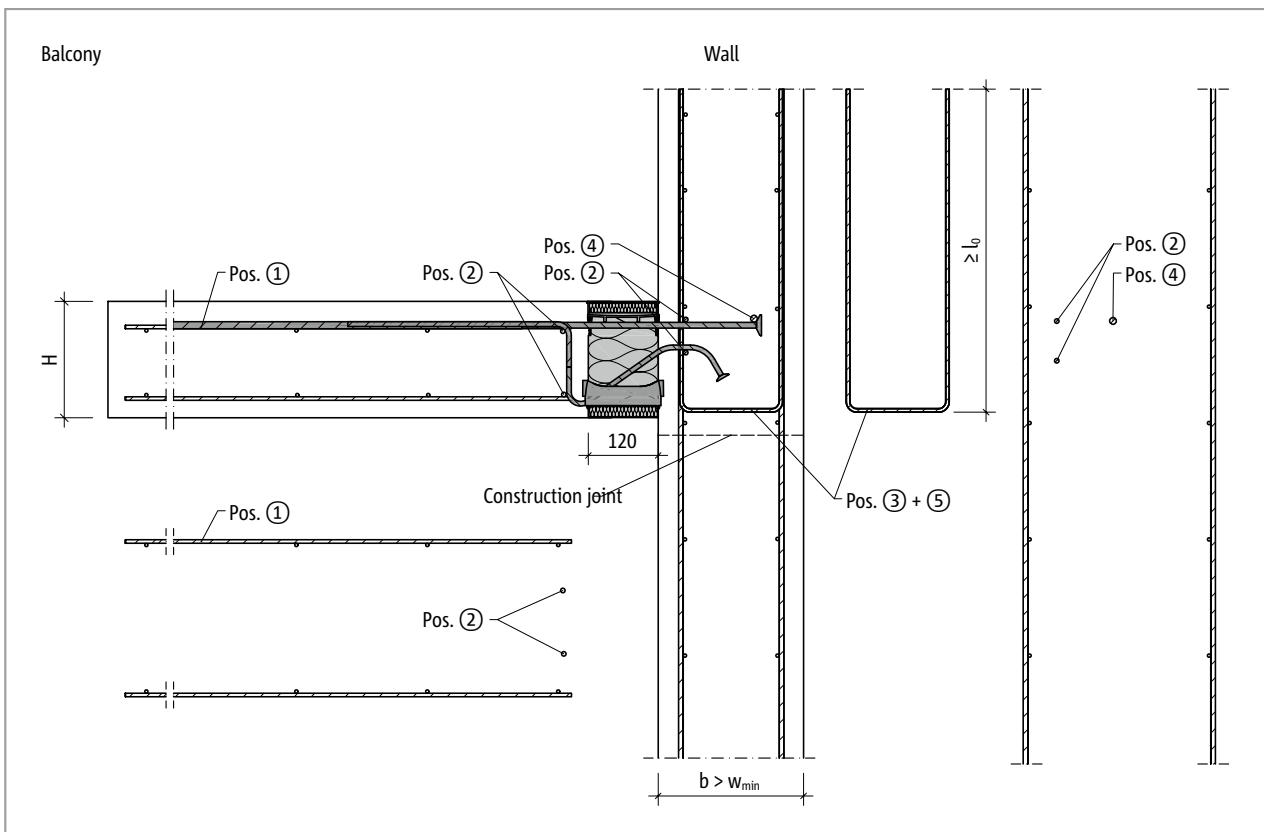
Schöck Isokorb® XT type K-U: On-site reinforcement for wall connection upwards with larger structural element dimension ( $w_{vorb} > w_{min}$ )
